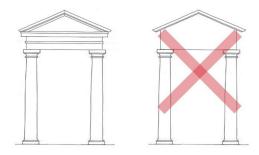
G.4.c: Columns spanned by a visually structural element
